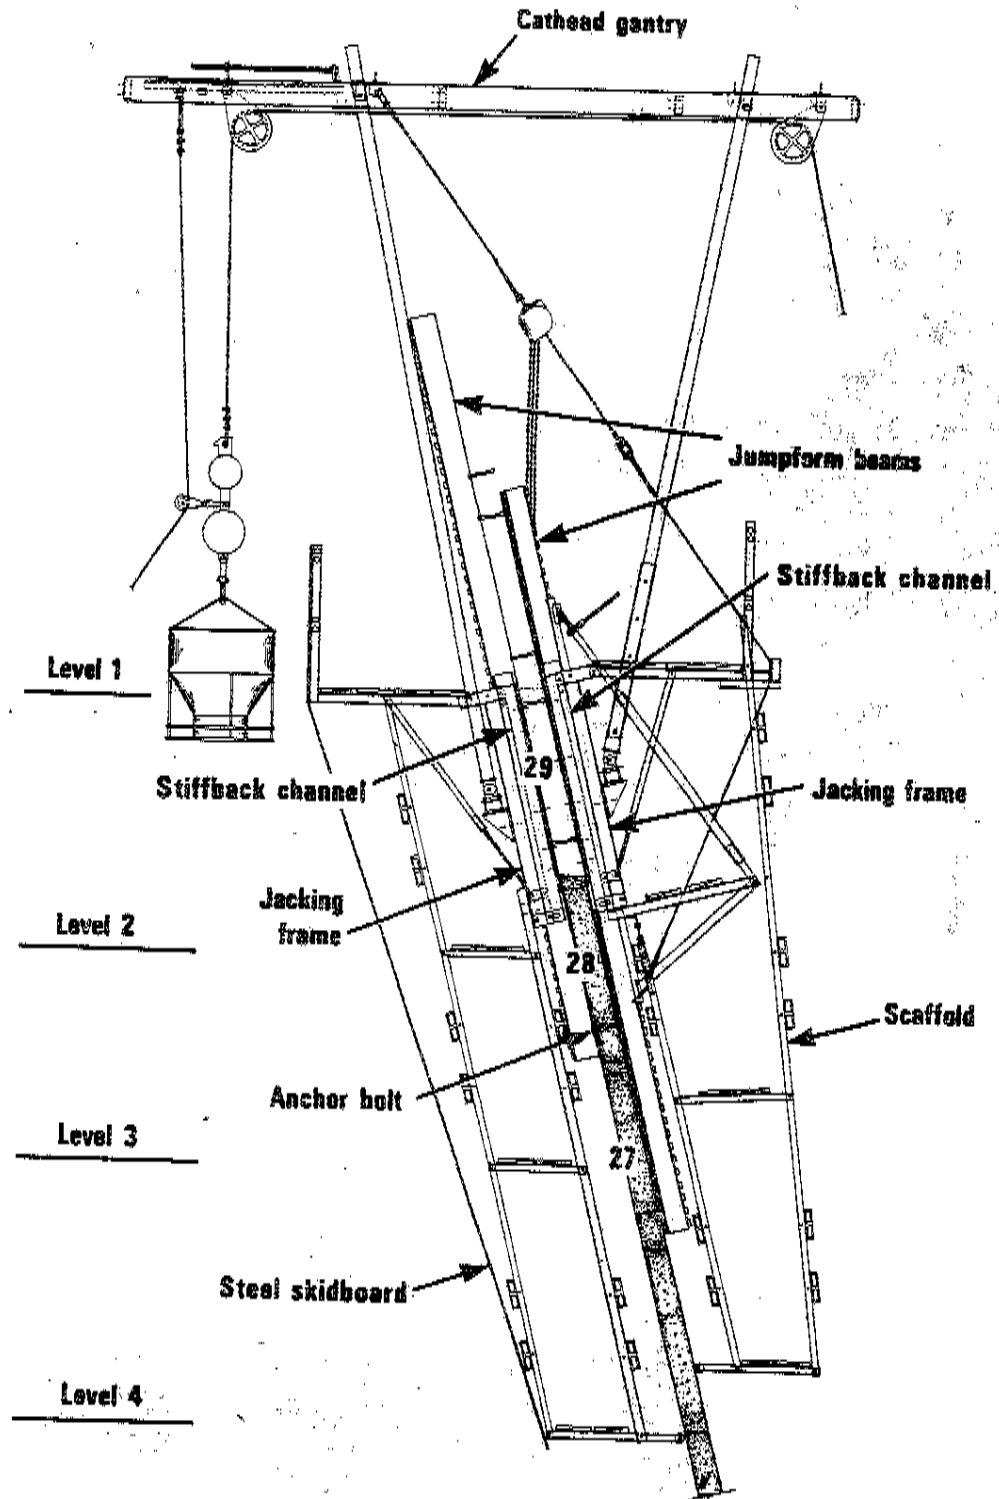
A Cross Section through the Formwork and Scaffolding Systems
